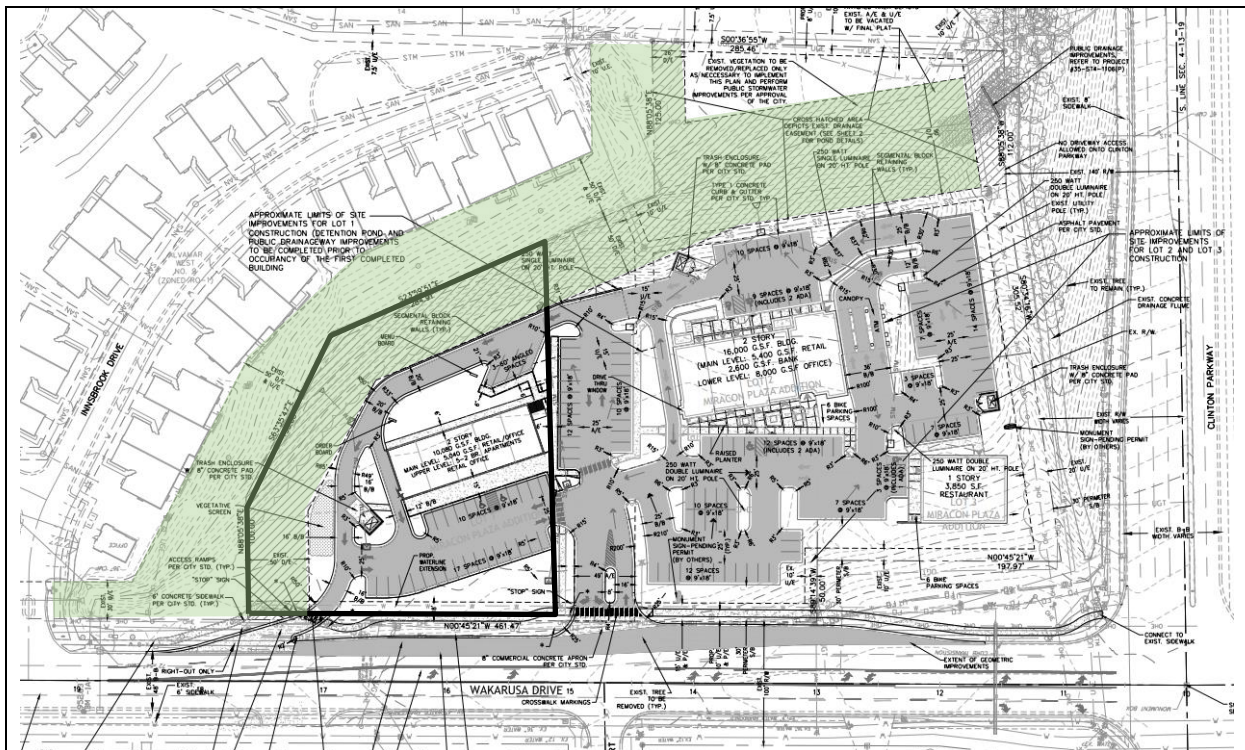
Concept plan for Miracon Plaza, Lot 1 is outlined, generally, drainage easement highlighted in green.
